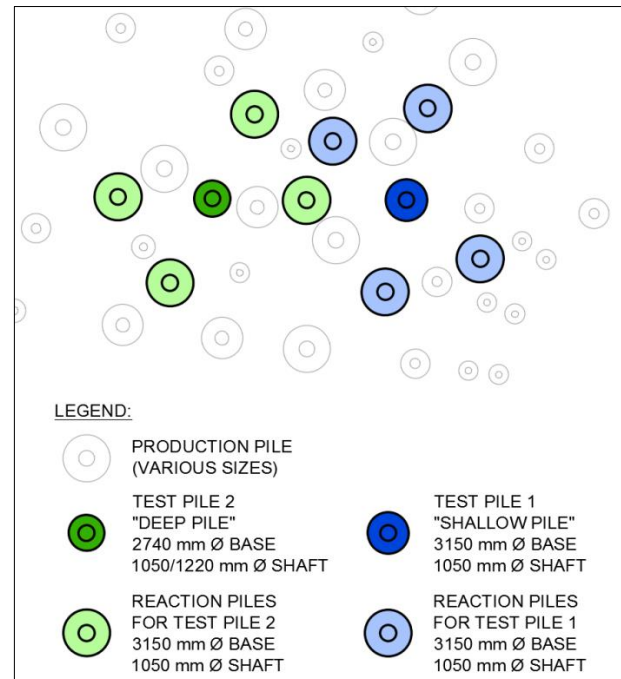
Load test TP1 and TP2 pile layout relative to planned production piles
